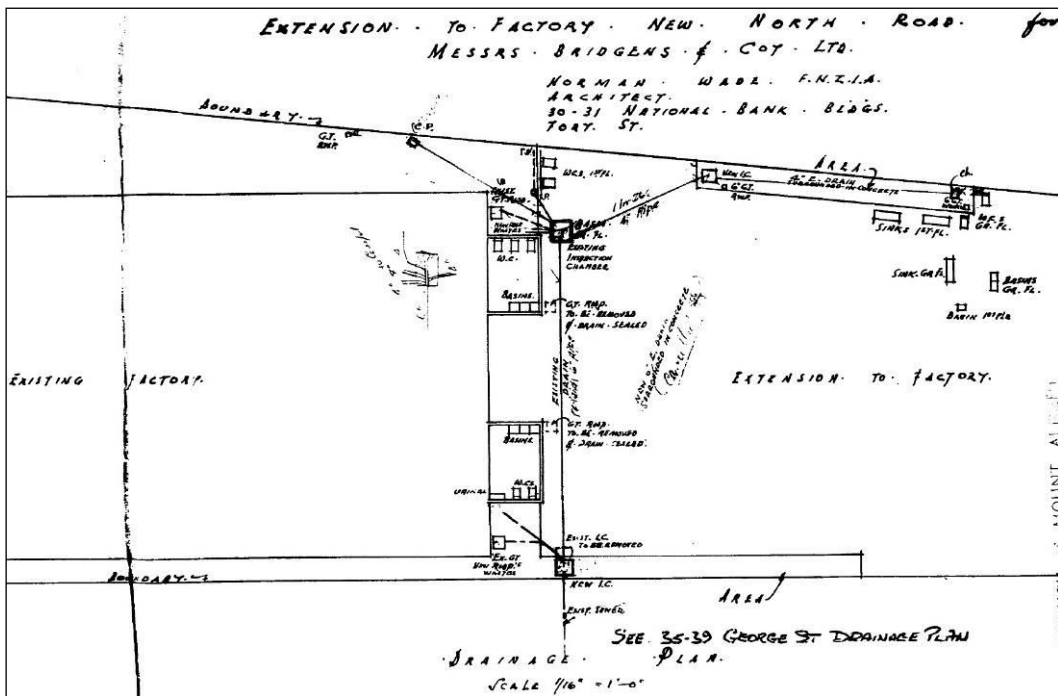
1929 Drawings for 'Extensions to Factory New North Road for Messrs Bridgens and Coy Ltd' - by Norman Wade, Architect: Drainage plan. The extension suffered major fire damage in 1998. It was redeveloped by Parker Brothers Ltd. The new building was then subdivided from the original factory building in 2000 – It is now therefore independent of the subject site. Auckland Council Filenet. Accessed October 2016. Extract. Full image above.
